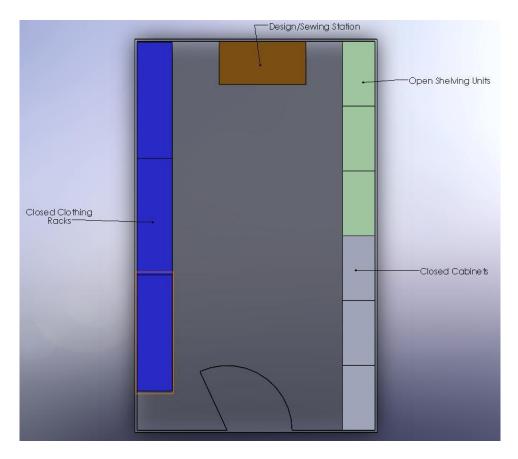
shows the second floor plan we designed, however we could not find the shelving units we had picked out online.
